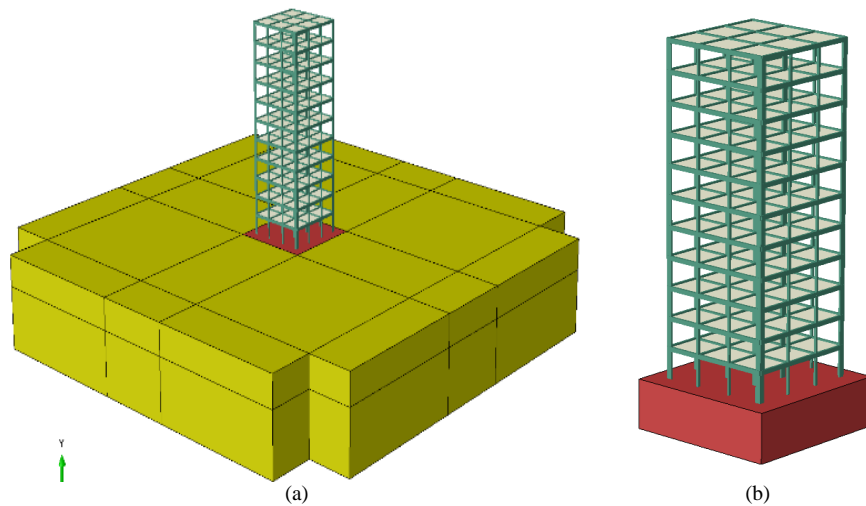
Abaqus 3D Modeling for building with shear wall bracing (a) with SSI (b) with fixed base
